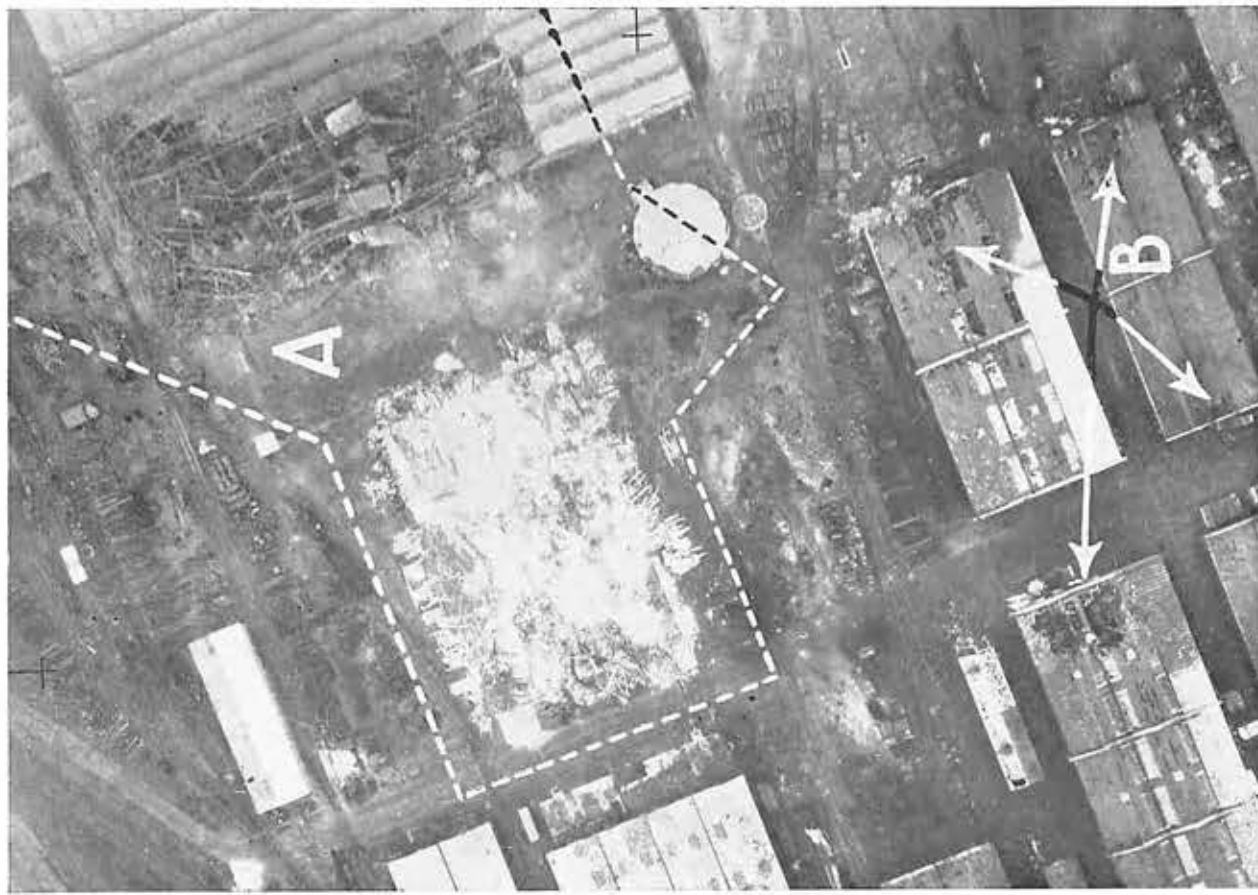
(A) Complete destruction was caused to an area of 30,000 square feet of the Locomotive Machine Shop, to an adjoining building 240 feet in length, and a storage tank was damaged by blast. (B) Other buildings damaged by H.E.
